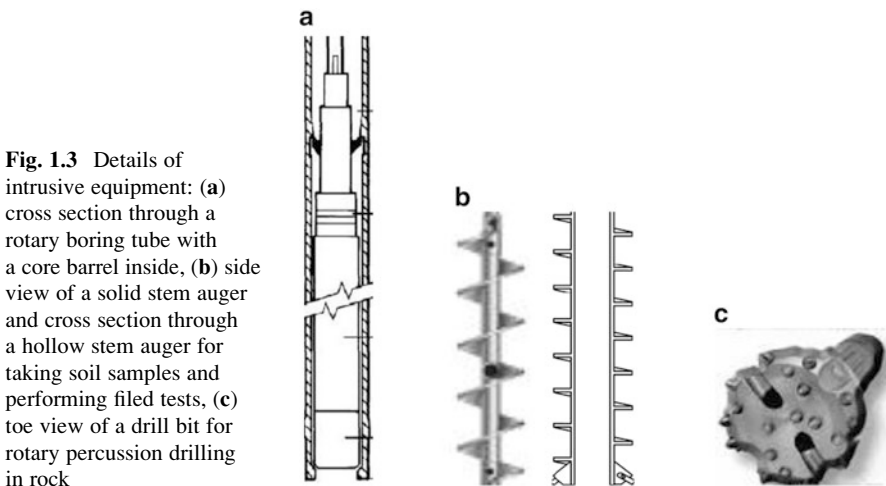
Details of intrusive equipment: (a) cross section through a rotary boring tube with a core barrel inside, (b) side view of a solid stem auger and cross section through a hollow stem auger for taking soil samples and performing filed tests, (c) toe view of a drill bit for rotary percussion drilling in rock
